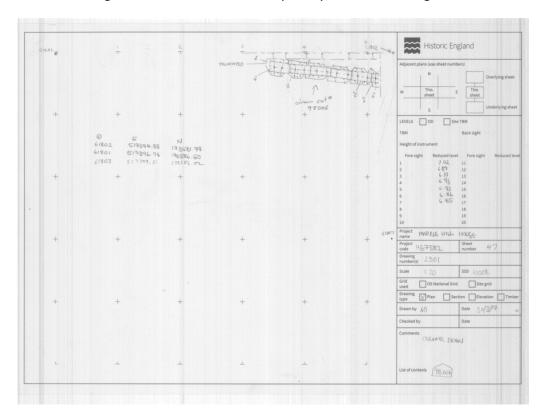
Plan 2801. Field drain in trench 8. Sheet 47.
